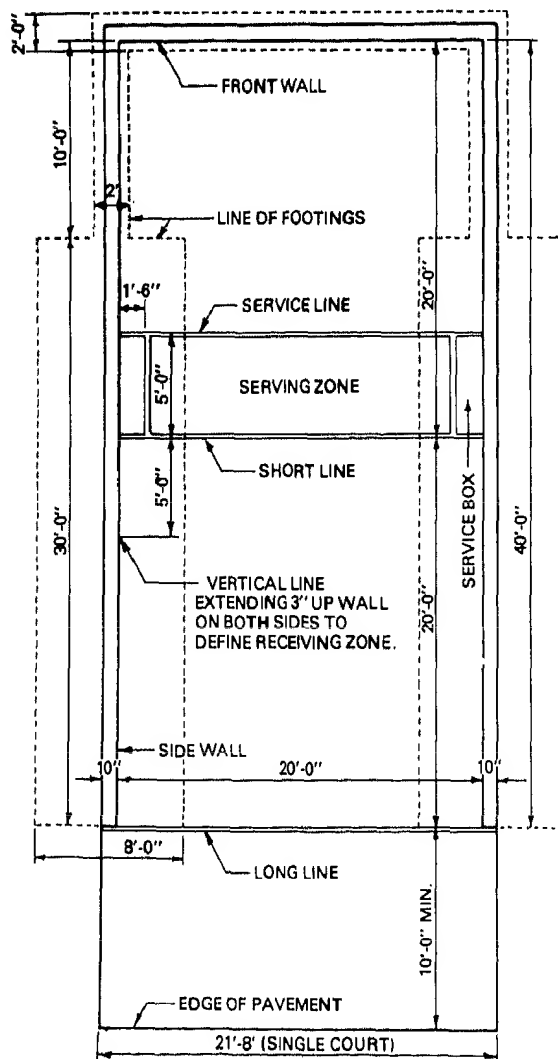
Handball court layout - four-wall. All court markings to be 1½ in wide and painted white, red, or yellow.
